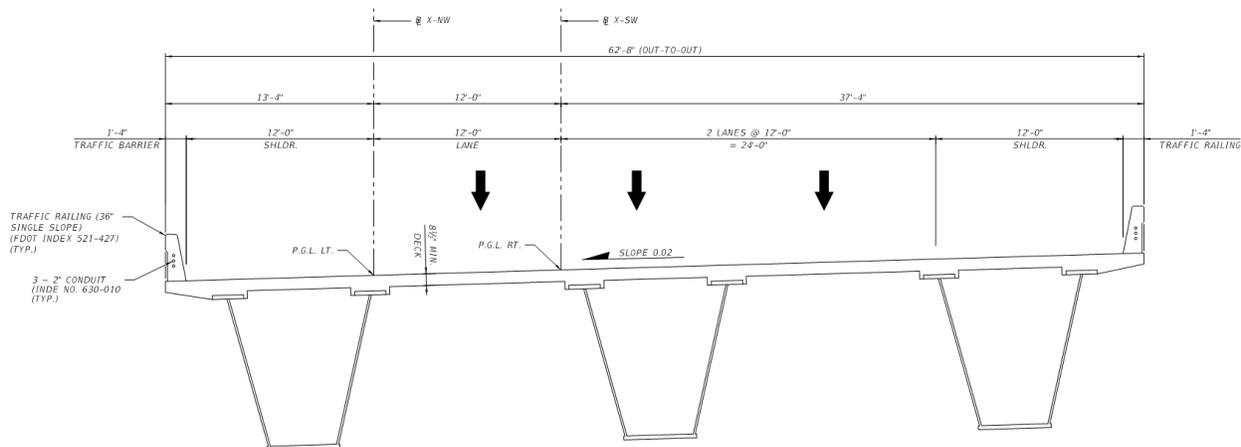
Bridge Typical Section (Bridge No. 10)
